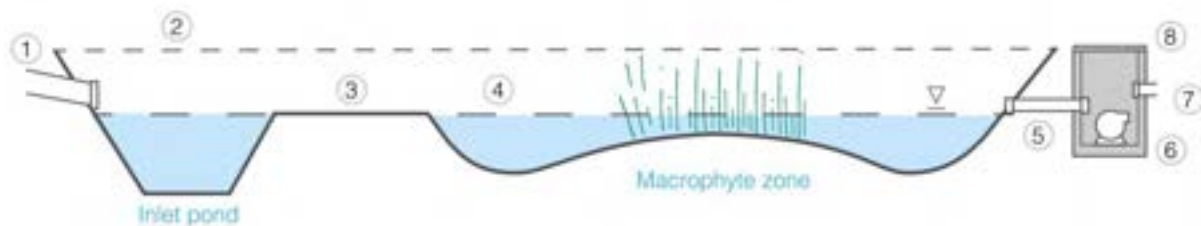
Cross section of a sediment pond and wetland with pump outlet
